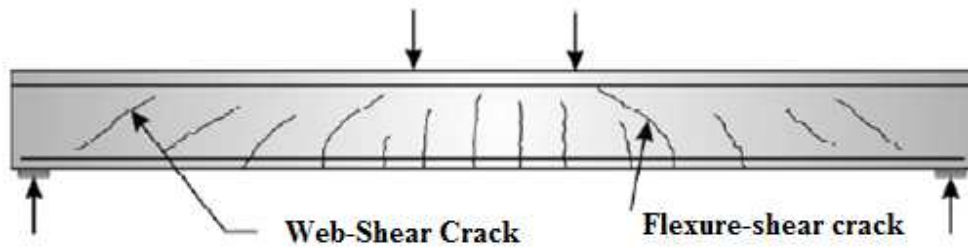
7 The inclined shear cracking presenting the web shear crack and the Flexural shear crack
